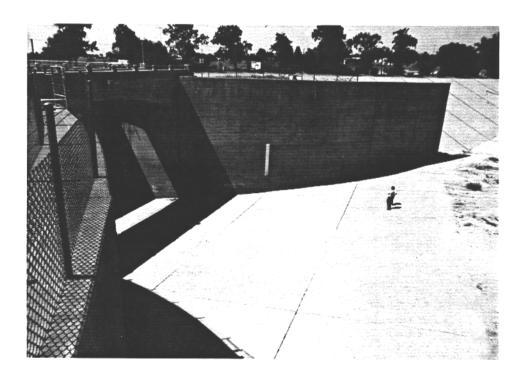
Lytle Creek Intake Structure. West Branch Intake With Tainter Gate Housing. Looking SW With West Wing Levee Beyond Intake.
